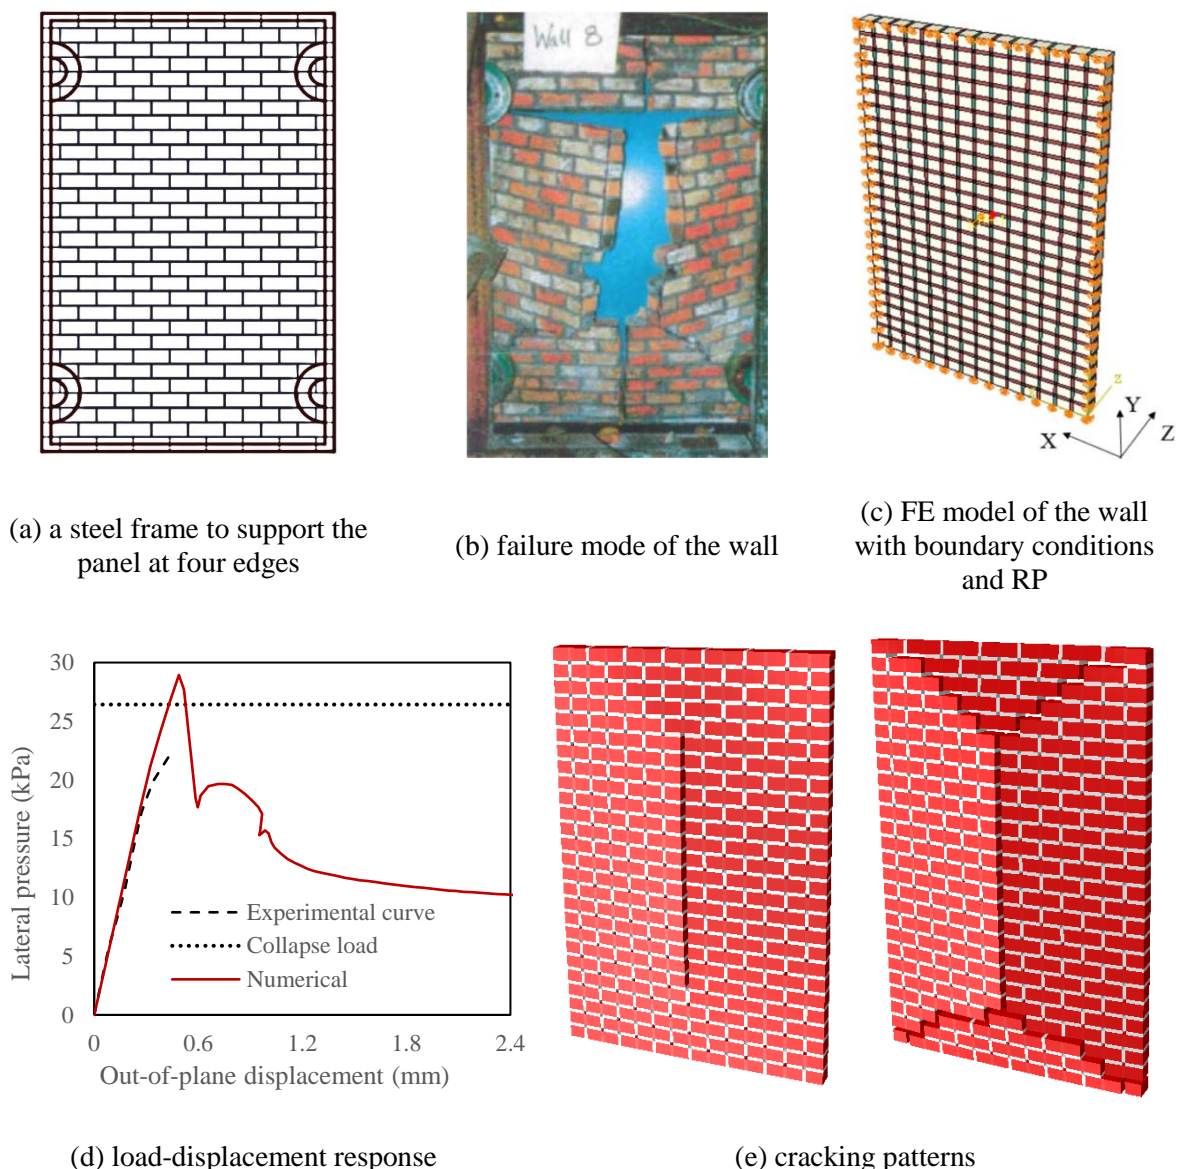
A masonry wall panel subjected monotonic out-of-plane loading
